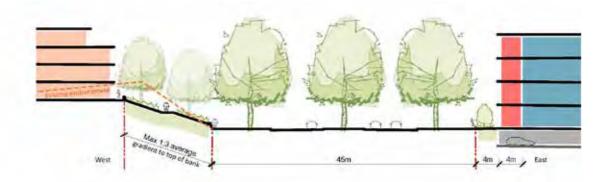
Typical cross section of John Gorton Drive (service trades area)
